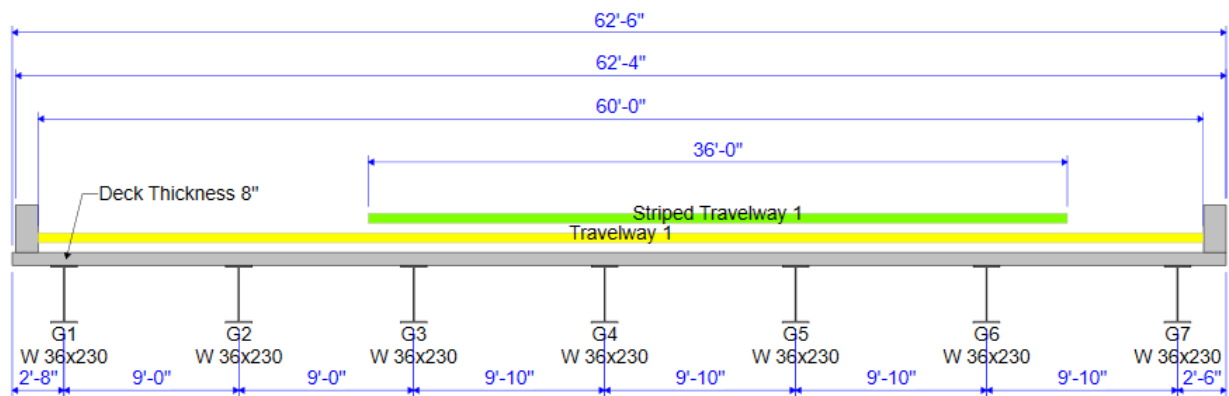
Bridge Cross Section for S080 40375 (AASHTOWare™ BrR, 2023)
